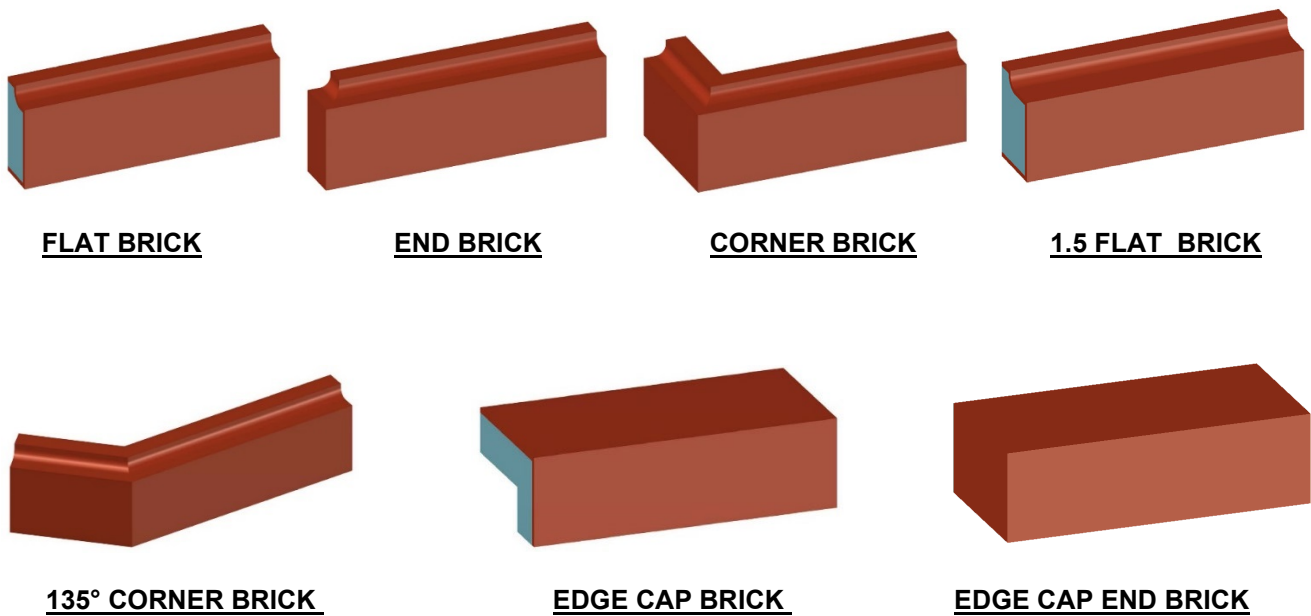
Flat Brick, End Brick, Corner Brick, 1.5 Flat Brick, 135° Corner Brick, Edge Cap Brick and Edge Cap End Brick Configurations
